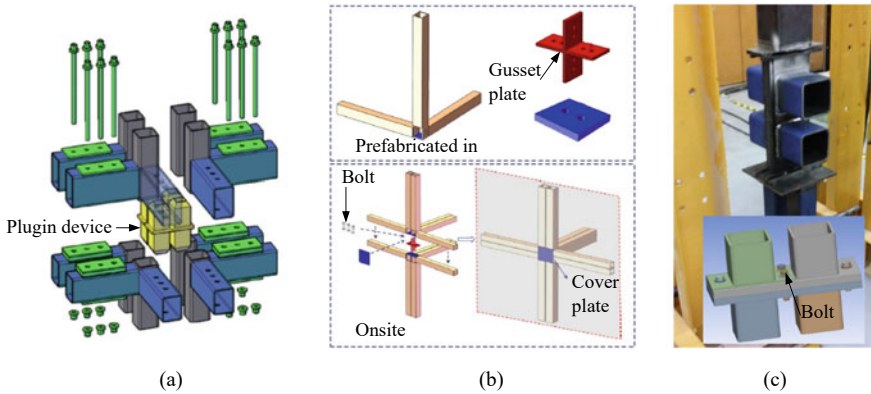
Bolted connection with a plug-in device [2]; b welded cover plate [6]; and c extended endplate [10]
